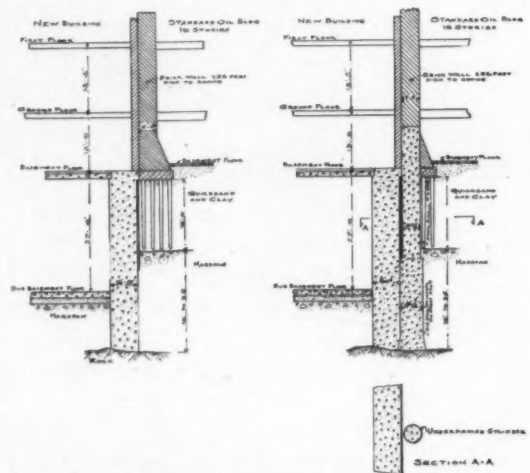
Sections through underpinning piers and foundations of the new building, taken between shore I and shore J
